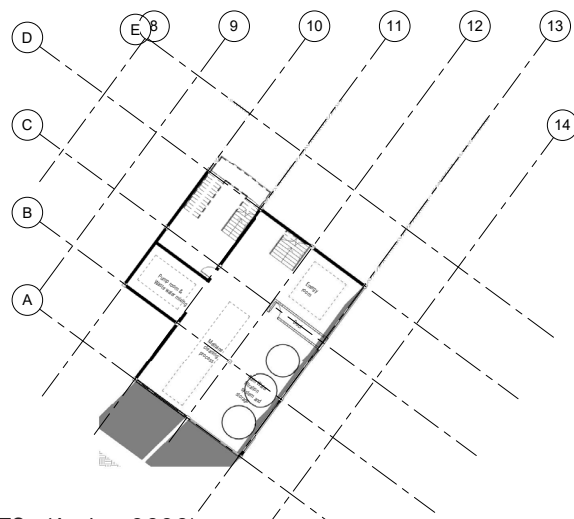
Semi-basement floor plan, NTS (Author,2020)
